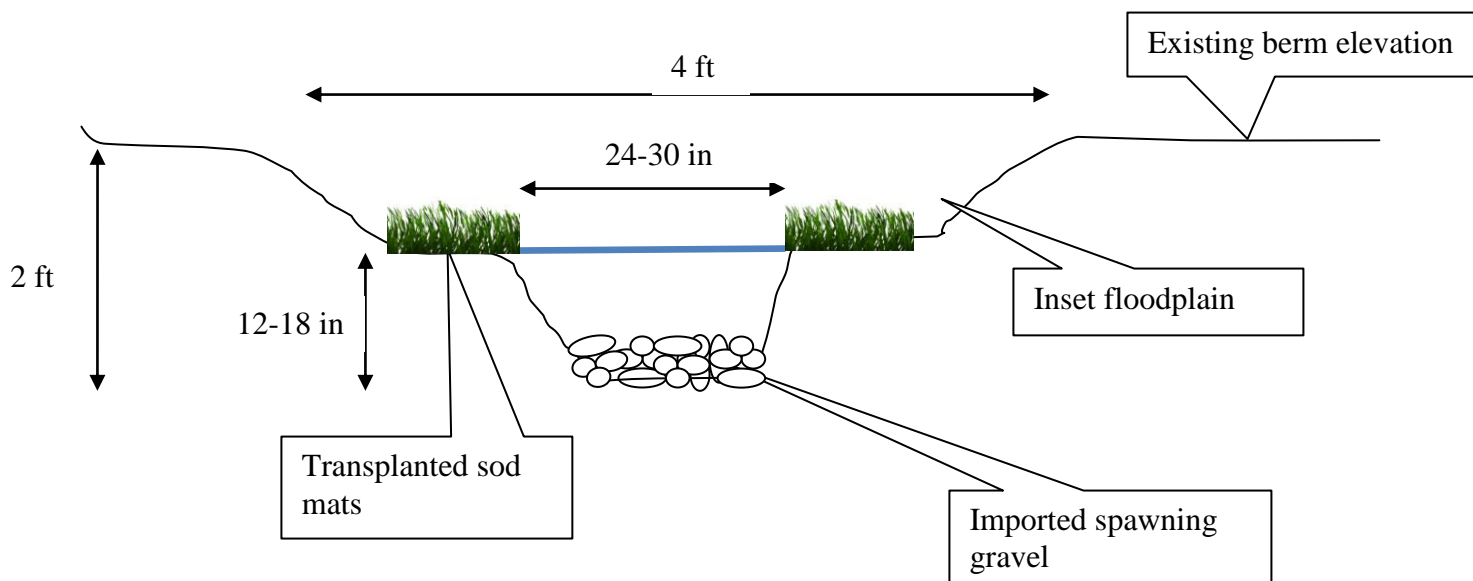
Cross section of the proposed spawning channel in the outlet of Van Houten Lake.
